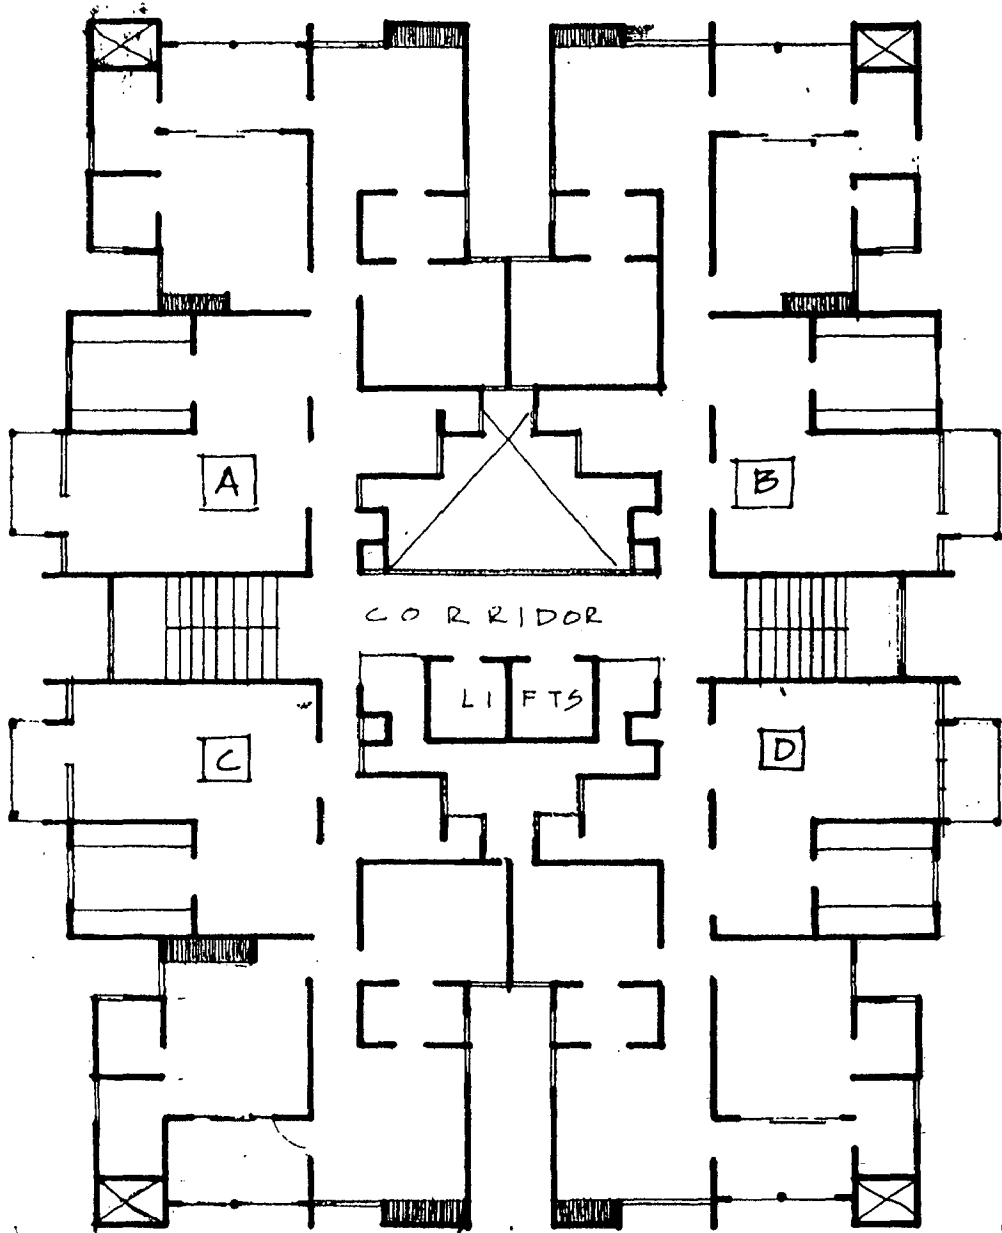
TYPICAL FLOOR PLAN (ANUPAM TYPE: A)
